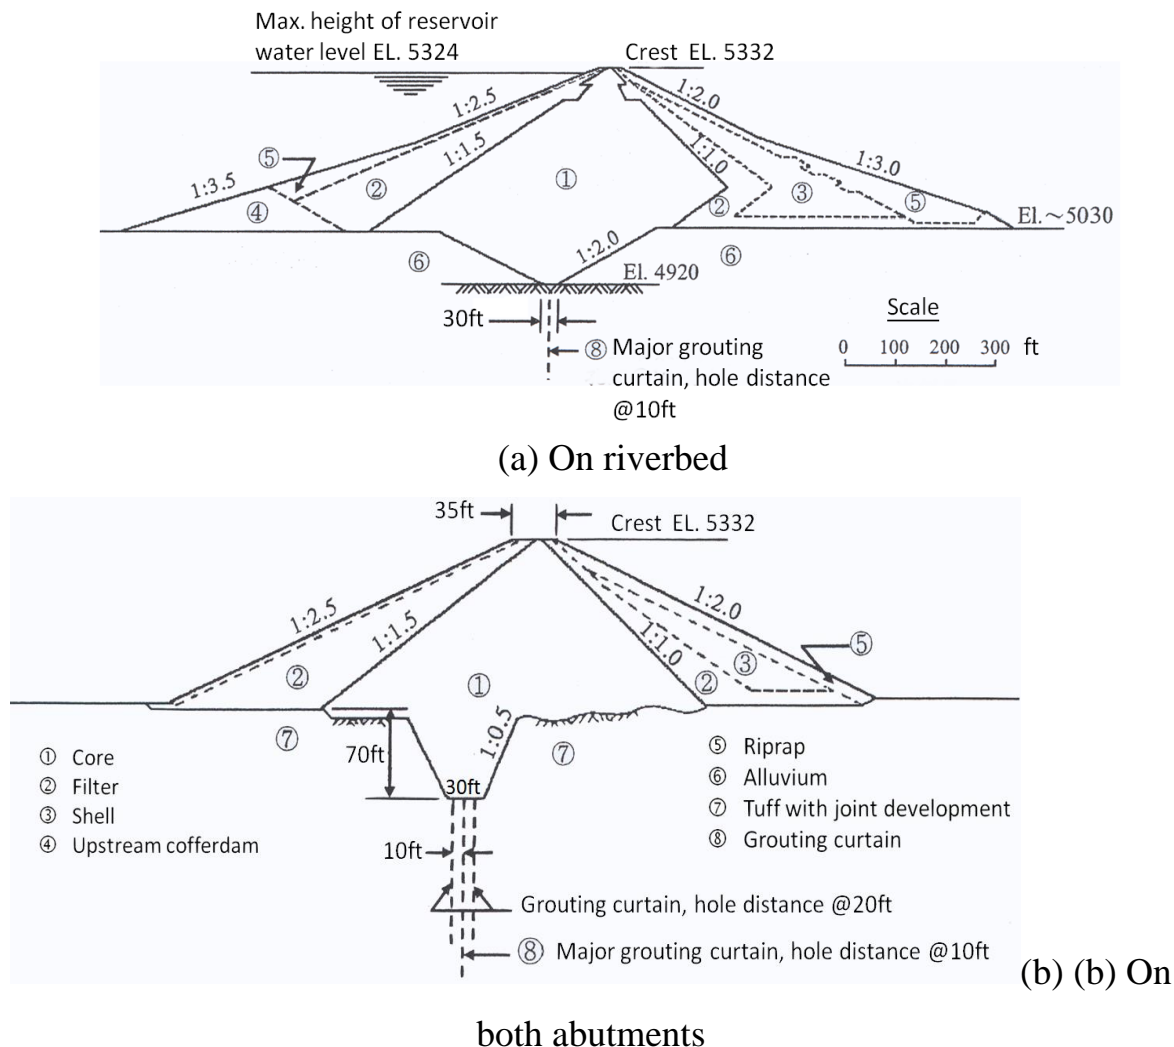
Cross section of Teton Dam (Sinotech Foundation for Research and Development of Engineering Sciences and Technologies, 2008)
